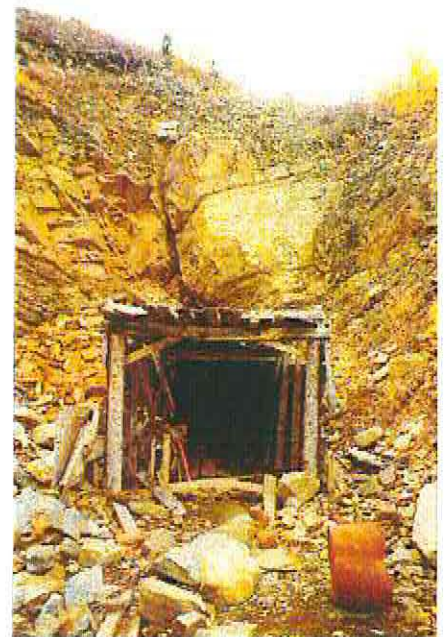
View of Adit 1 at Maybrun site. (AZ 234)
